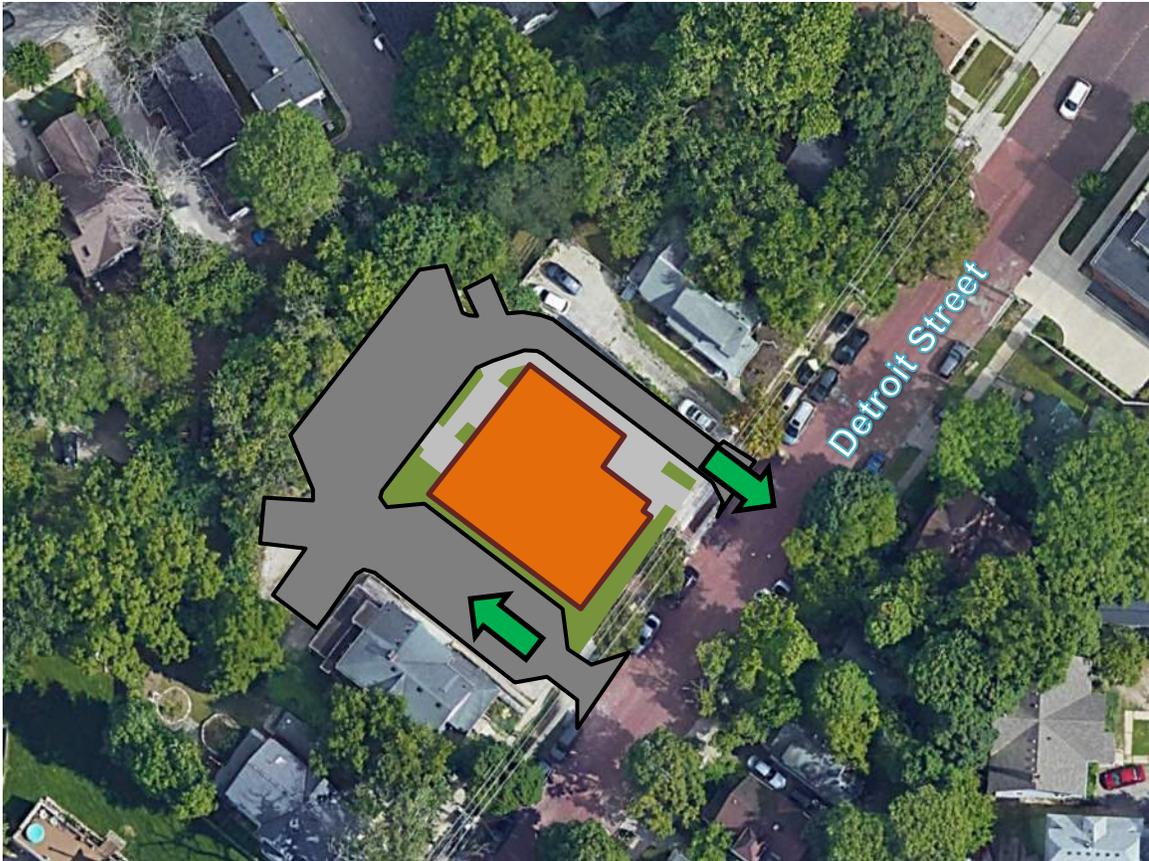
Redeemer Ann Arbor access to/from Detroit Street.
